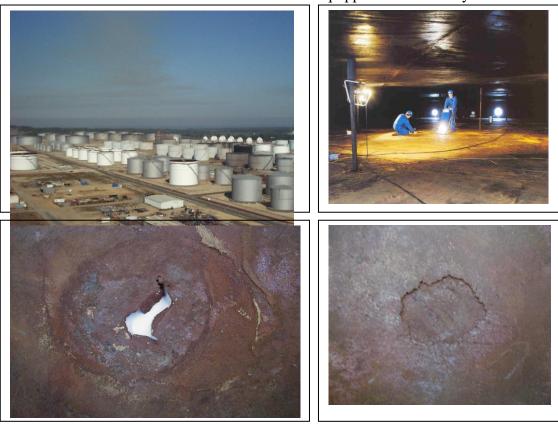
A Tank farm and manual inspection of a floating-roof tank looking for corrosion and pitting defects on both topside and underside of tank floor
